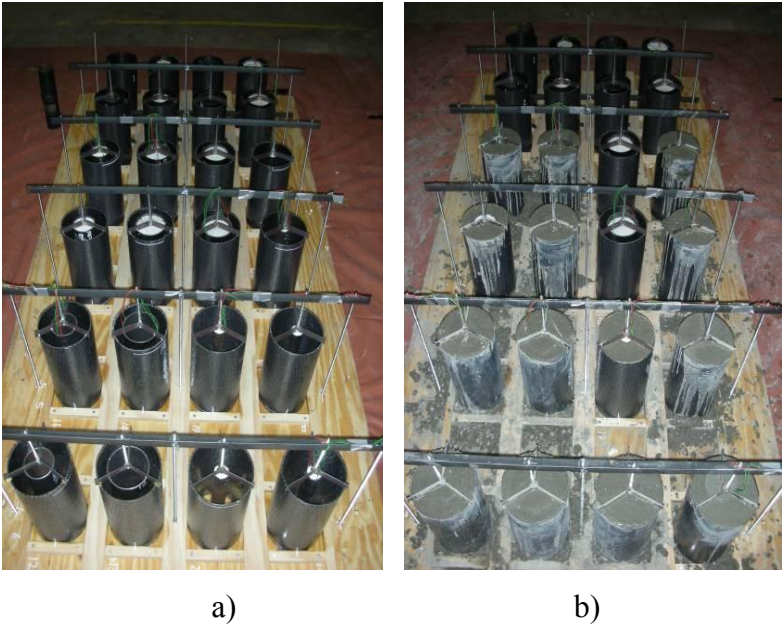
Formwork used in manufacture of DSTC specimens: a) before pouring of concrete, b) after concrete pouring
